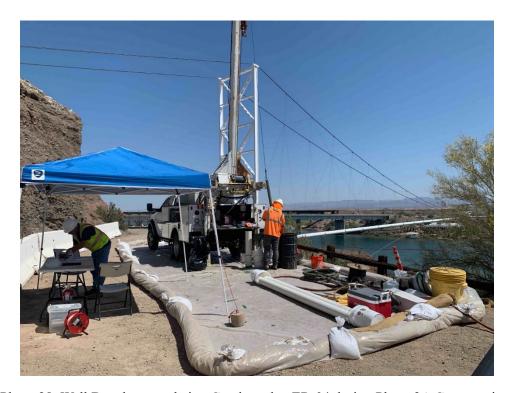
Well Development being Conducted at ER-04 during Phase 2A Construction.
